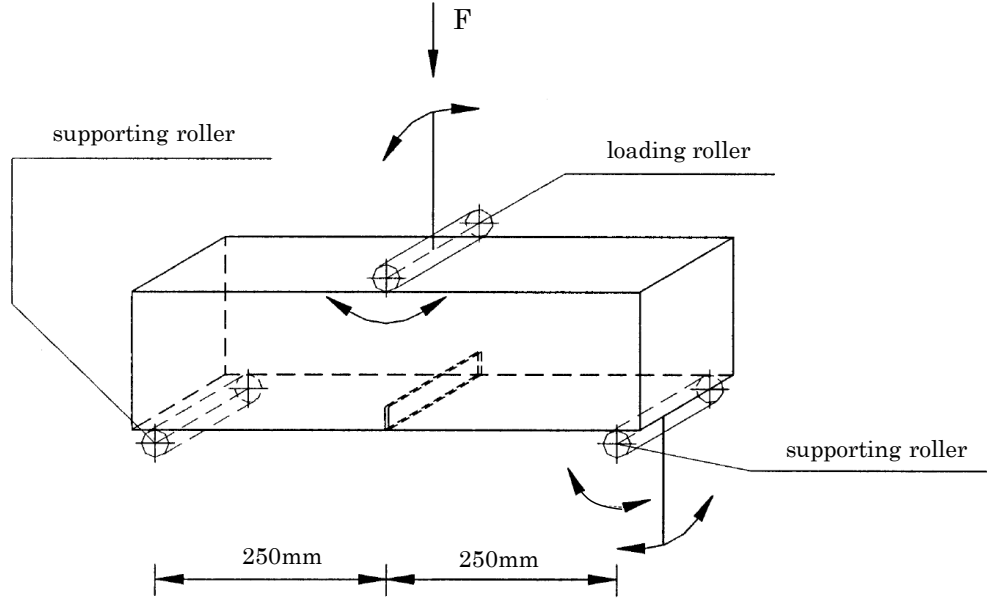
Loading arrangement of notched beam specimen (BS EN 14651, 2005).
